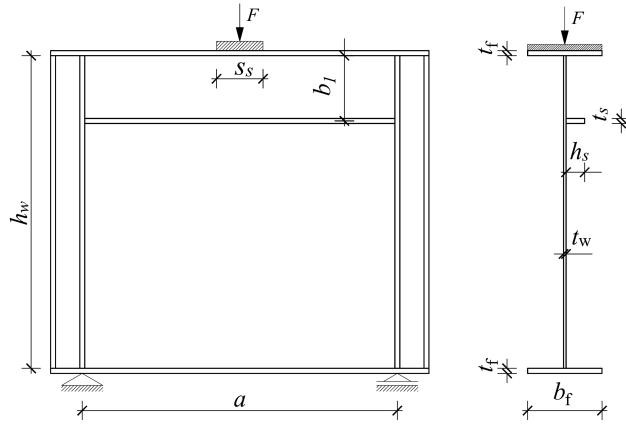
Longitudinally stiffened plate girder under transverse concentrated loading, general notation.
